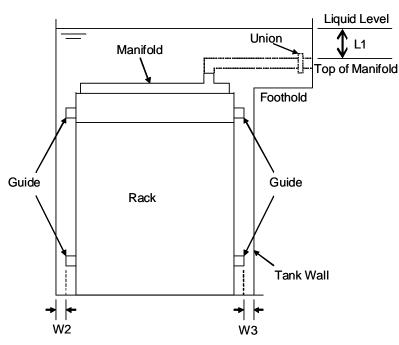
Rack Layout in Membrane Submerged Tank (side view)
